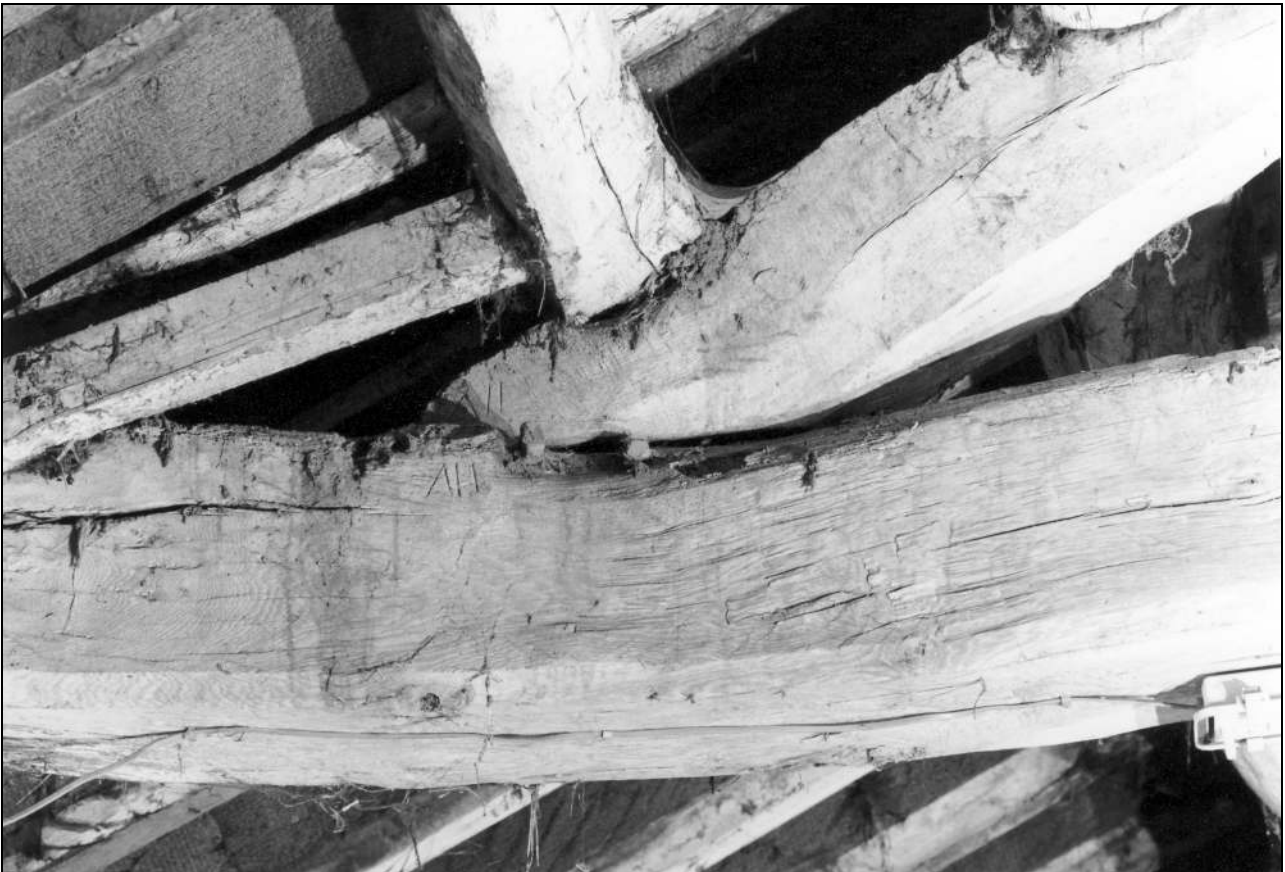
Truss 4: west end of tie beam, from the south, showing joint numbering "IIV" (film 5, frame 10)
